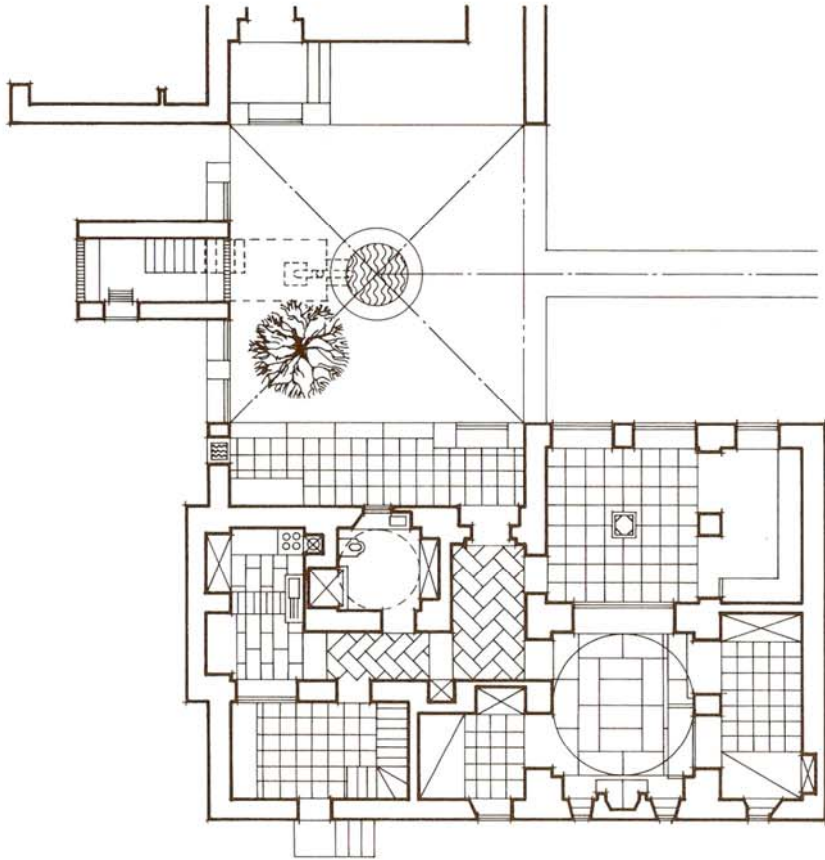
Plan of part of the Sidi Krër house, Alexandria, Egypt, showing details for the pump room under the courtyard. Design by Hassan Fathy. (See p. 56.)
